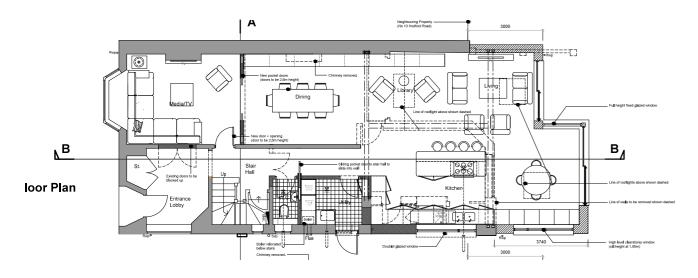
Proposed Ground Floor Plan - 8 Hodford Road
